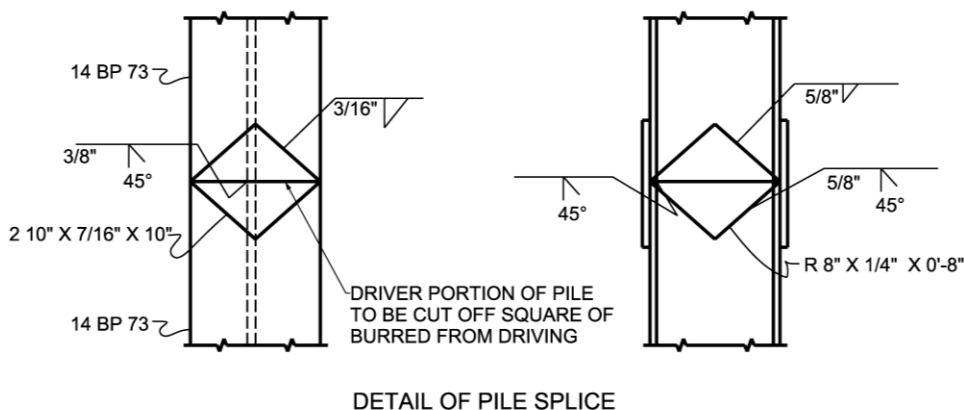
Illustration. Steel pile splice detail from bridge plans.
